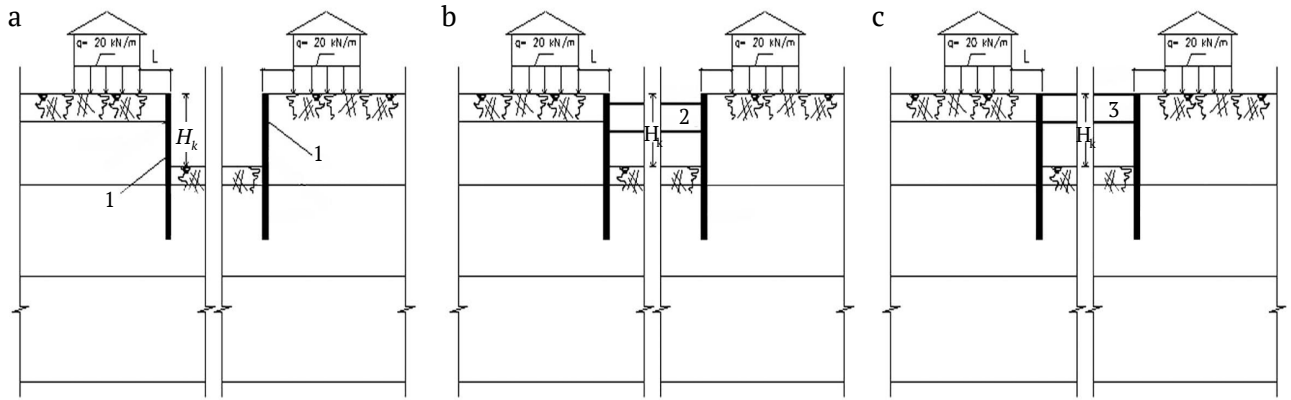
Geotechnical model of the construction project involving restraining systems: a) anchors (1), b) steel tube struts (2), c) reinforced concrete slabs (H_k of 8 to 10 m).
